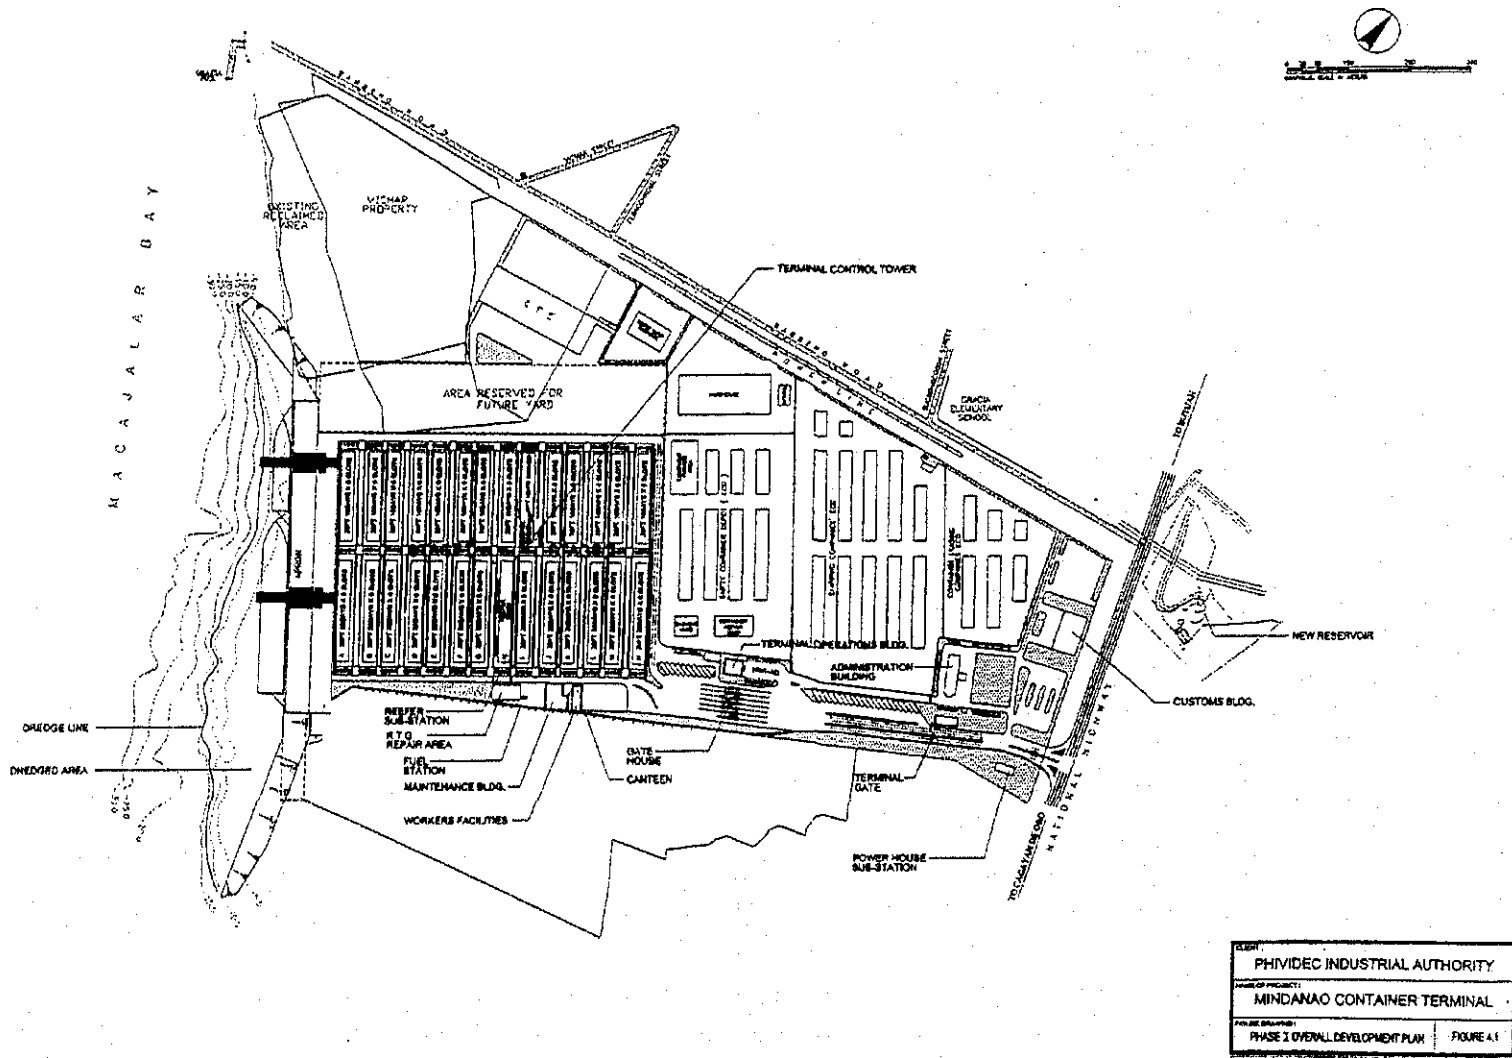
Layout Plan - Mindanao Container Terminal Port
